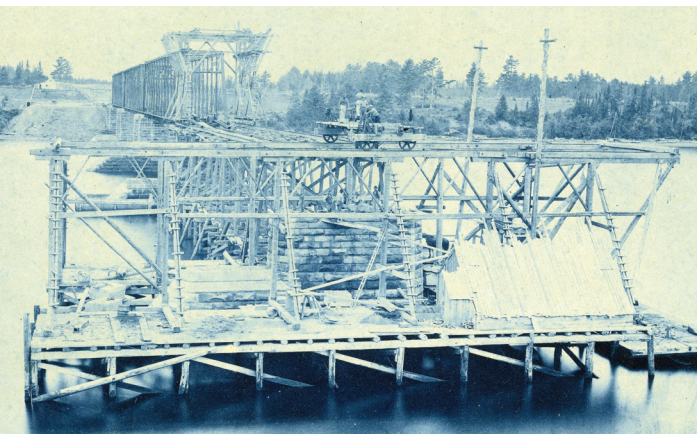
Construction of bridge, circa 1874 (Provincial Archives of New Brunswick, P119 Frank Sayer collection, P119-MS2I-093).
